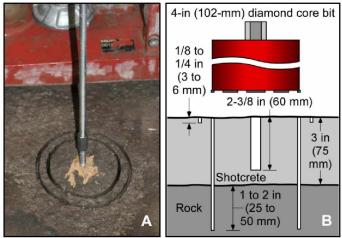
Drill hole configuration: (A) plan view and (B) vertical cross section.
